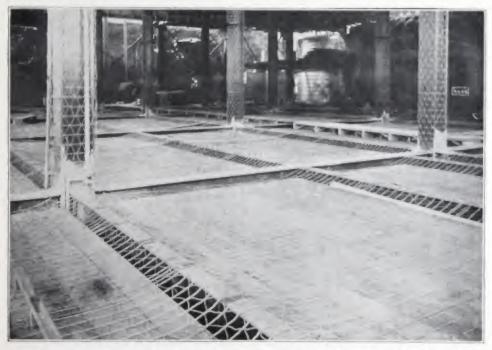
Ballargeon Building, Seattle, Wash. Steel framing fireproofed and floor slabs reinforced with Triangle Mesh Reinforcement.
